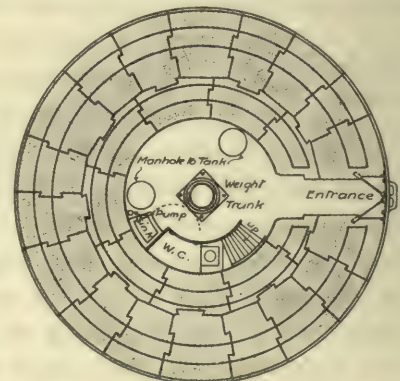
JOINTS IN MASONRY OF NEW EDDYSTONE LIGHTHOUSE.
